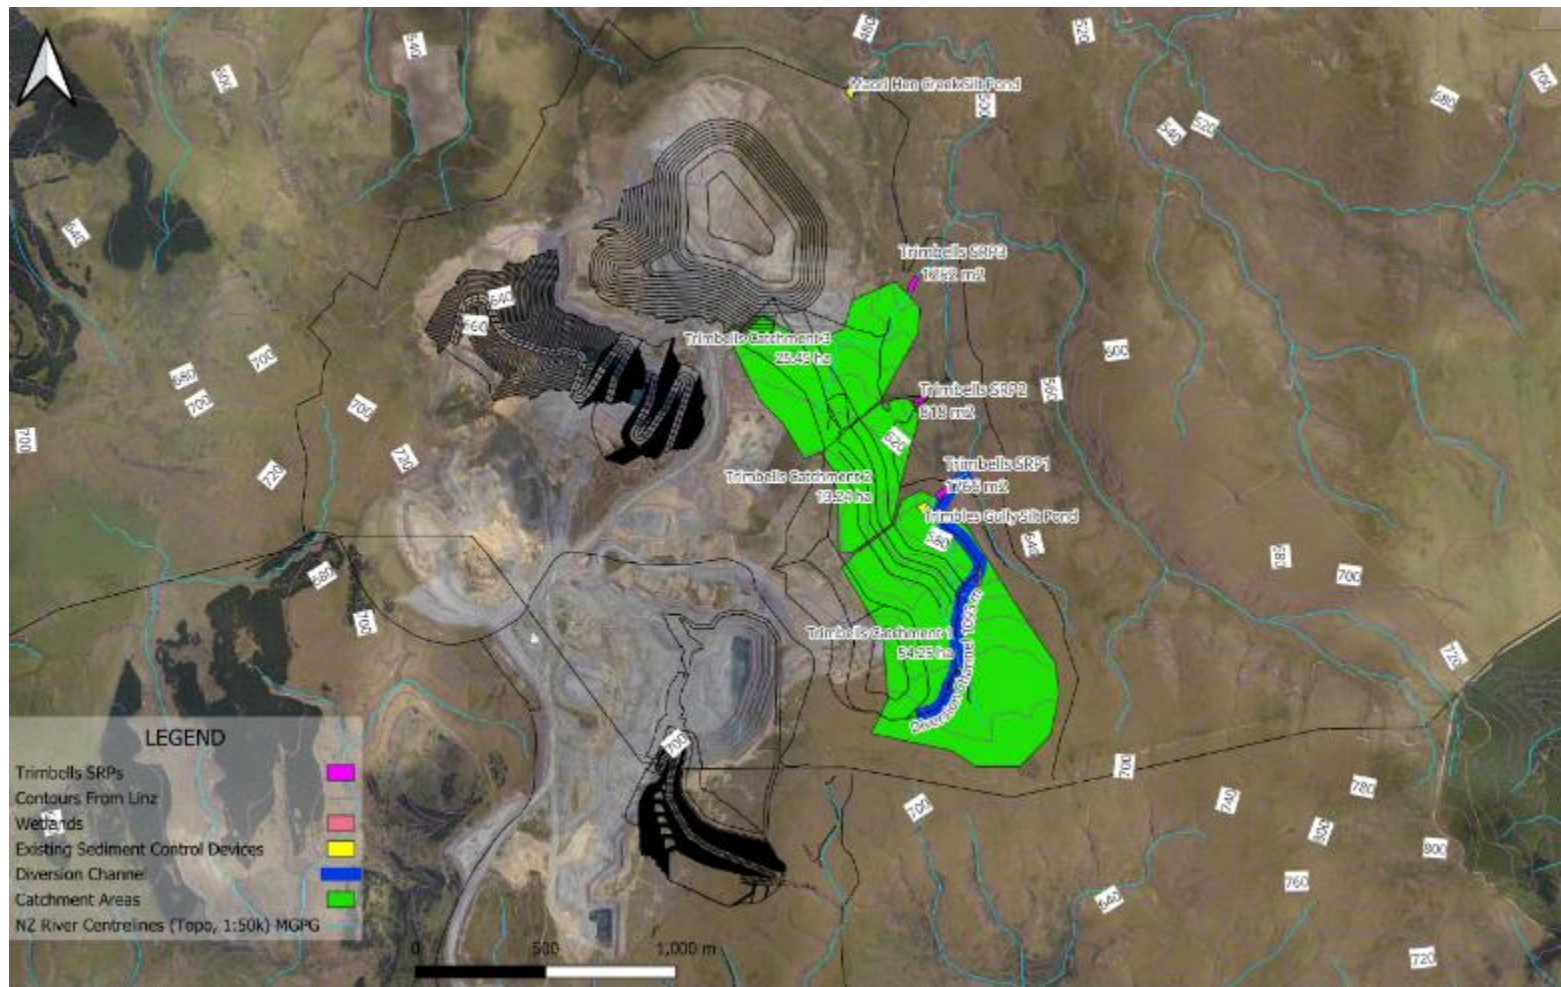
Location of Trimbells Sediment Retention Pond (Source: EGL, 2026d)
